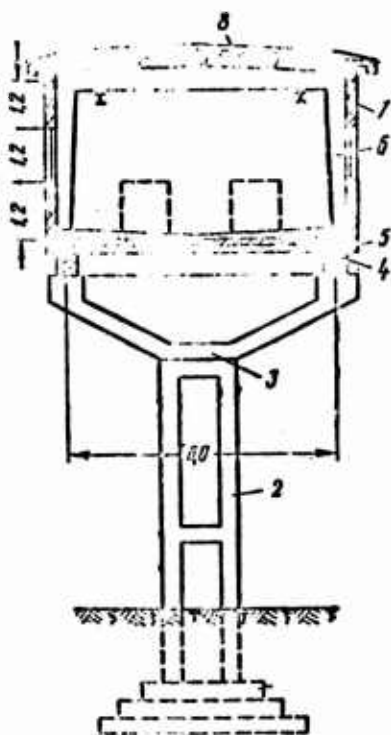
Structural conveyor galleries with a span of 12 m made from prestressed reinforced concrete: 1 - foundation; 2 - structural ferroconcrete upright; 3 - structural prestressed ferroconcrete crossmember; 4 - structural ferroconcrete prestressed (standarized frame-supporting) beam with an inclined lower chord having a length of 11.94 m ; 5 - structural ferroconcrete flooring slabs; 6 - structural ferroconcrete transverse frame; 7 - structural single-layer panels of the walls; 8 - structural prestressed ferroconcrete capping slabs.
